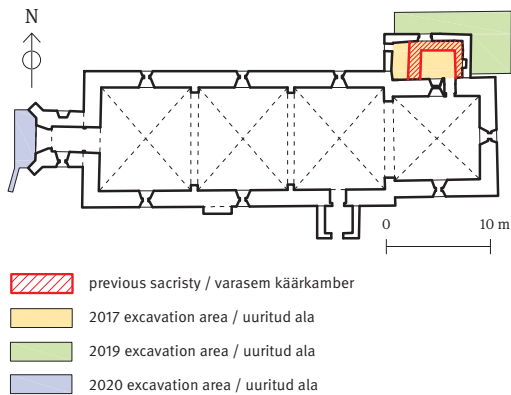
Plan of Järva-Jaani church and excavation areas.
